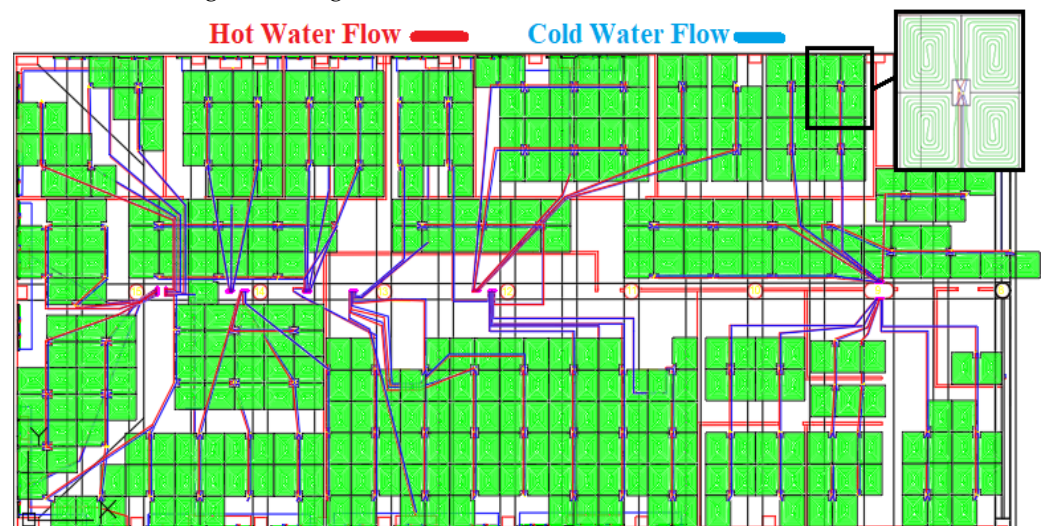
Technical drawing for ceiling panels used in the radiant system (3rd floor).
